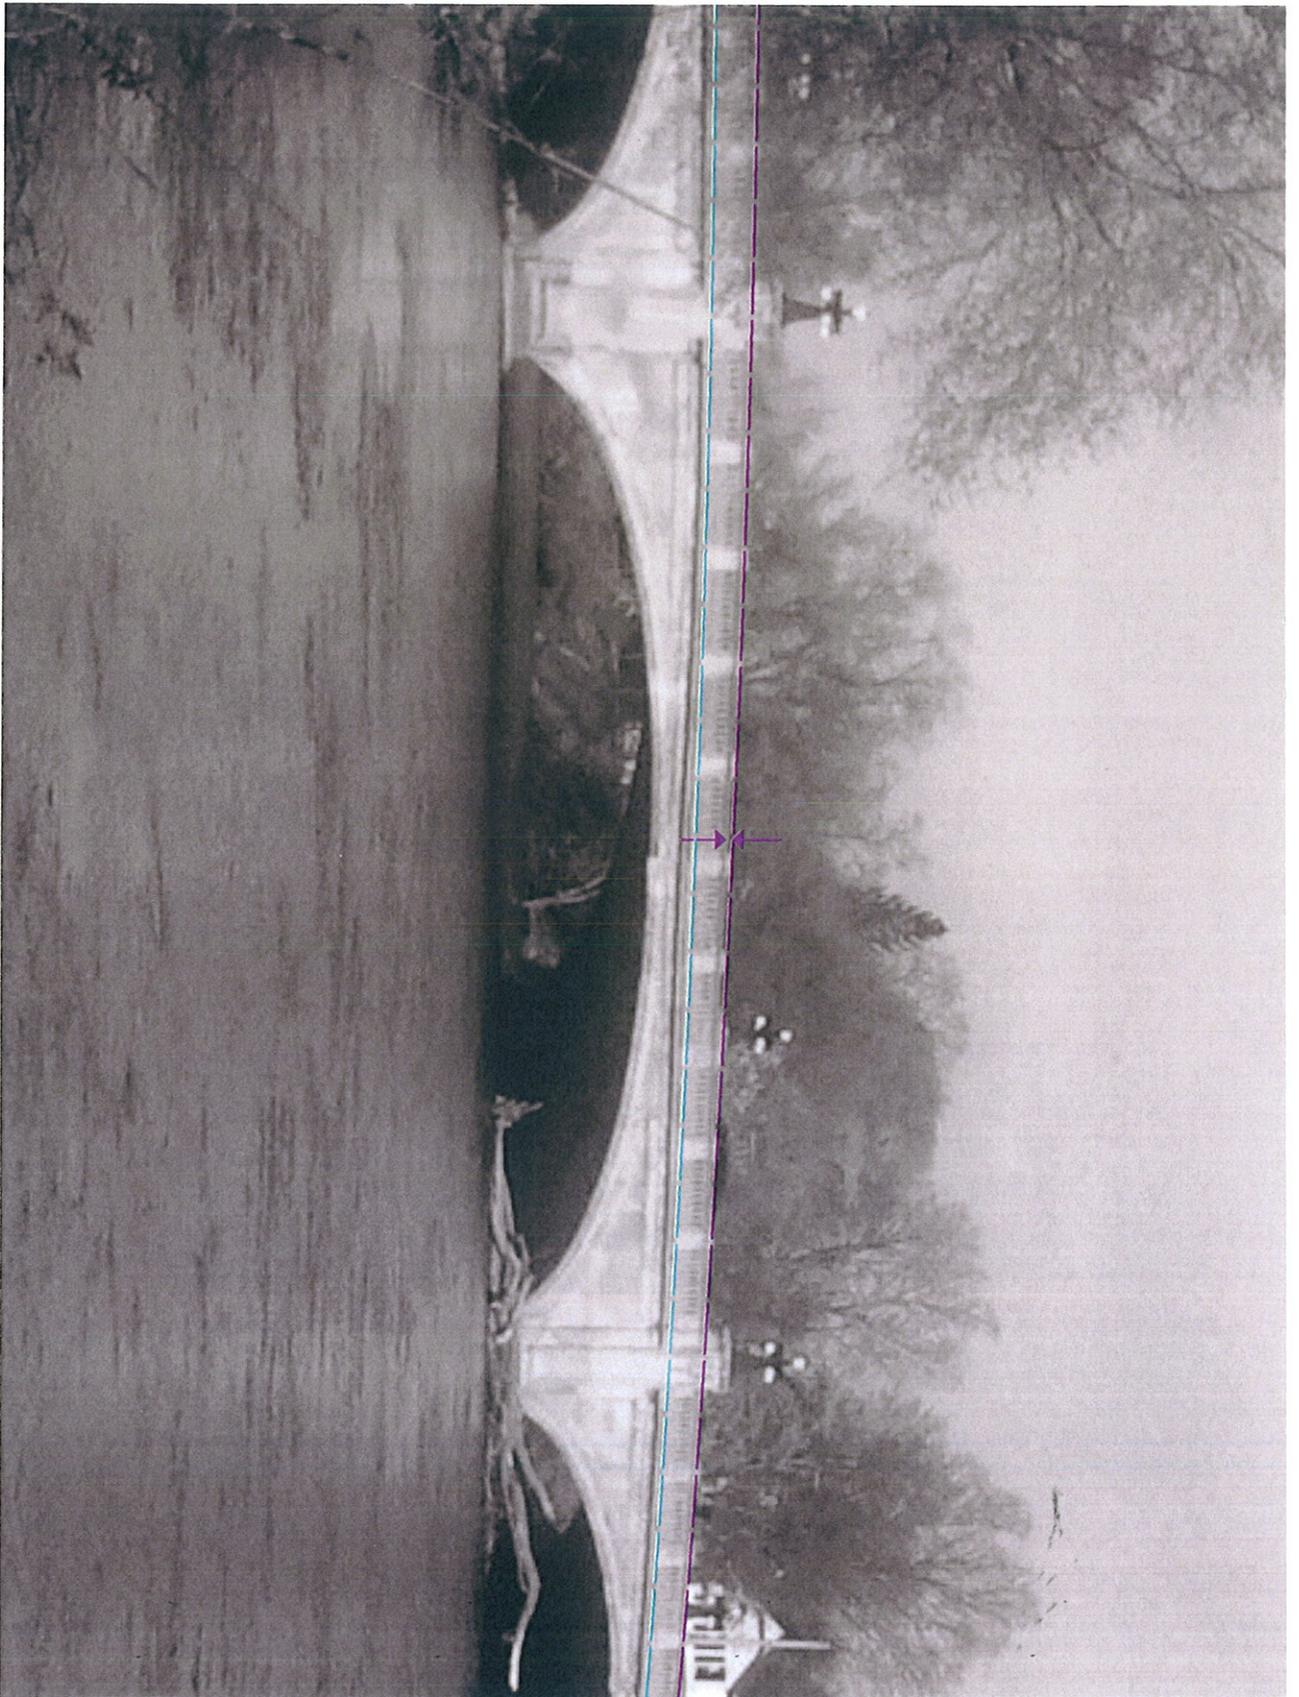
PHOTO A Michigan Street Bridge South Bend, IN East Facade
